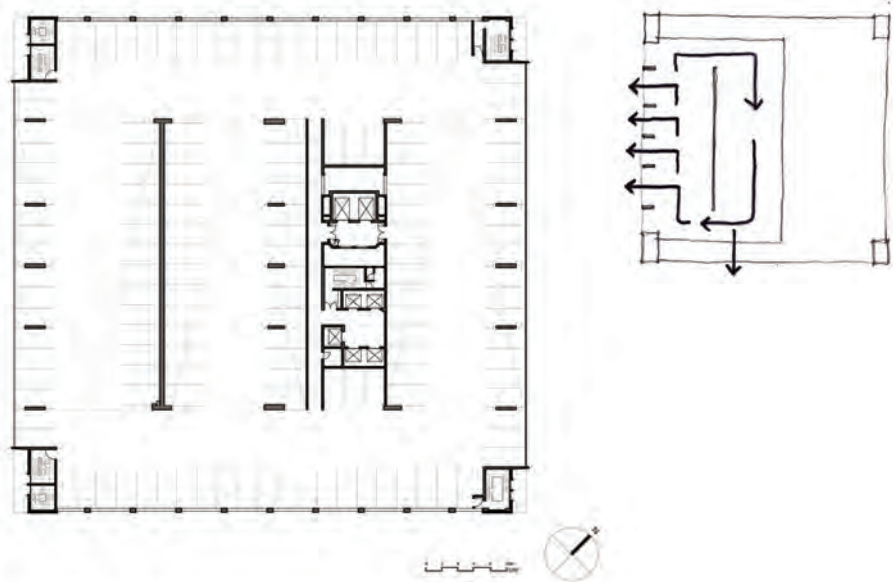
A CO2 sensor and shunt fans shall be installed to naturally ventilate the parking area as much as possible
